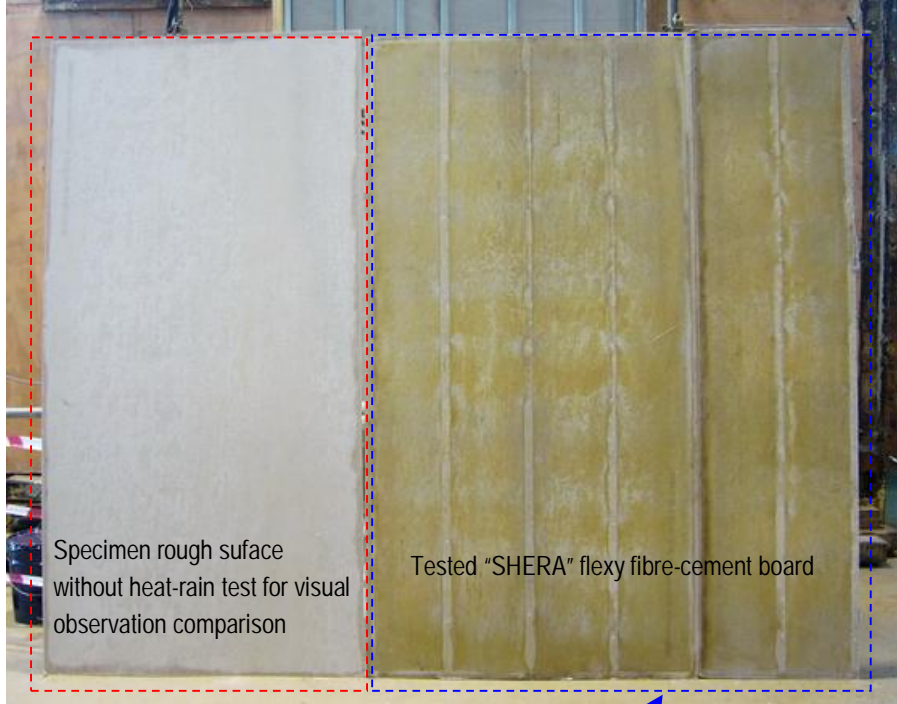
Visual observation of specimen rough surface installed facing outside test chamber after after heat-rain test.
